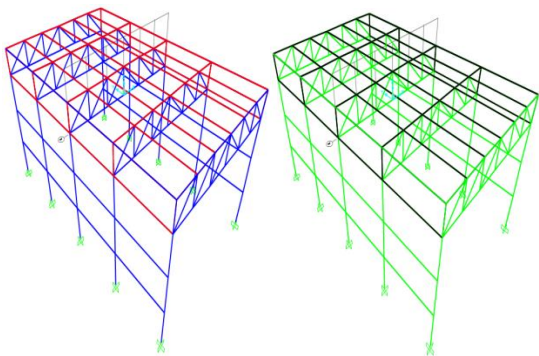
3D view of Howe truss with steel or with cold - formed steel
